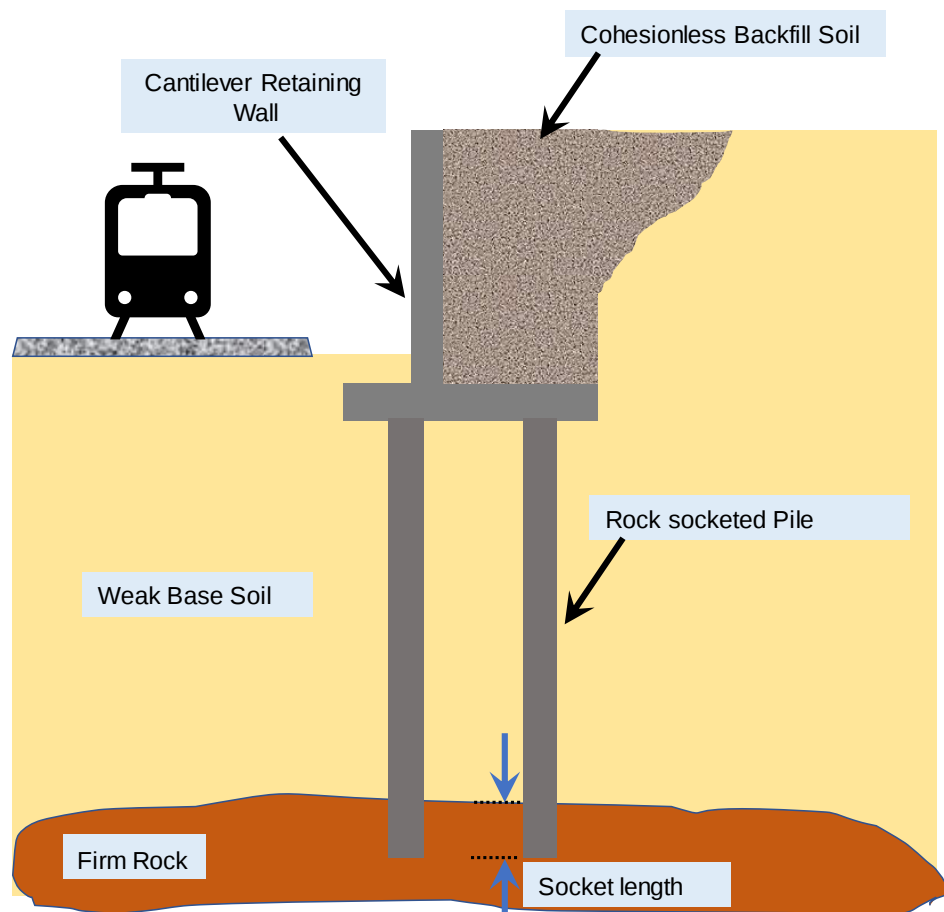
Cantilever retaining wall founded on rock socketed pile foundation.
